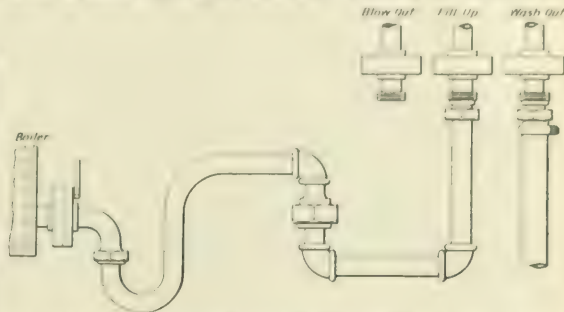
Ball Joint Pipe to Connect Blow Out and Filling Up Lines of Boiler Changing System.
